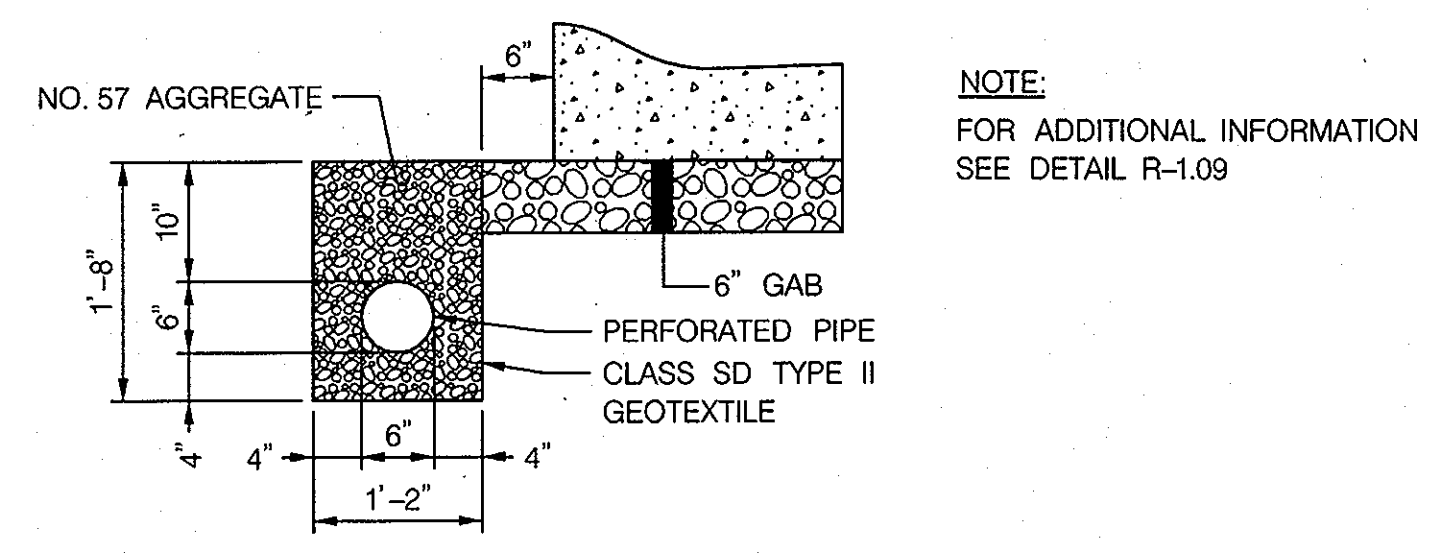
DETAIL FOR MODIFIED COMBINATION CURB AND GUTTER CONSTRUCTION
